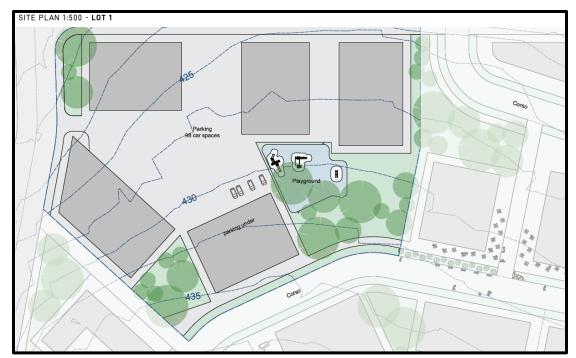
Lot 1 of the Mixed-Use Precincts Site Plan (Source: Robert Harwood Architects))
